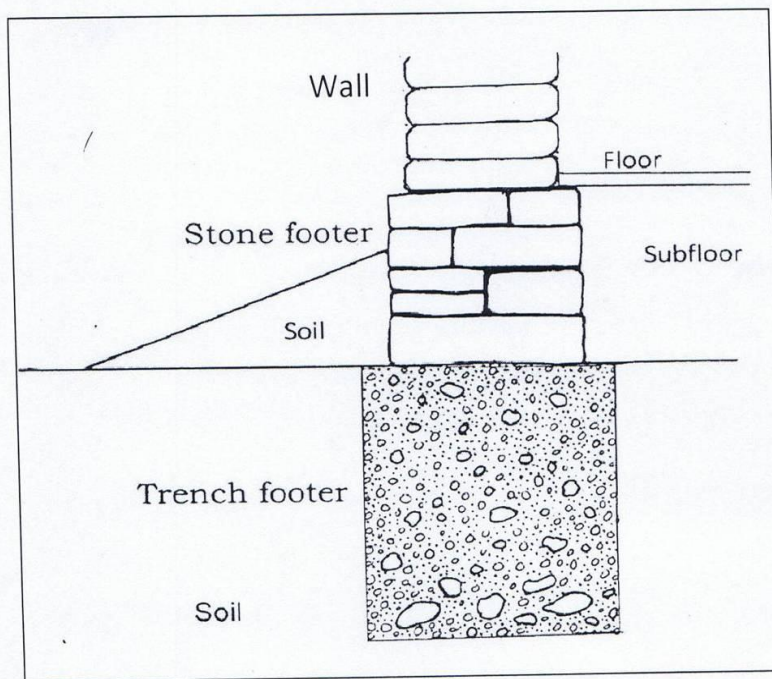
Dual Footed Foundation.* Stone or top footer above grade; trench or bottom footer below grade with gravel infill. Note that the flooring will be a separate structural entity.
